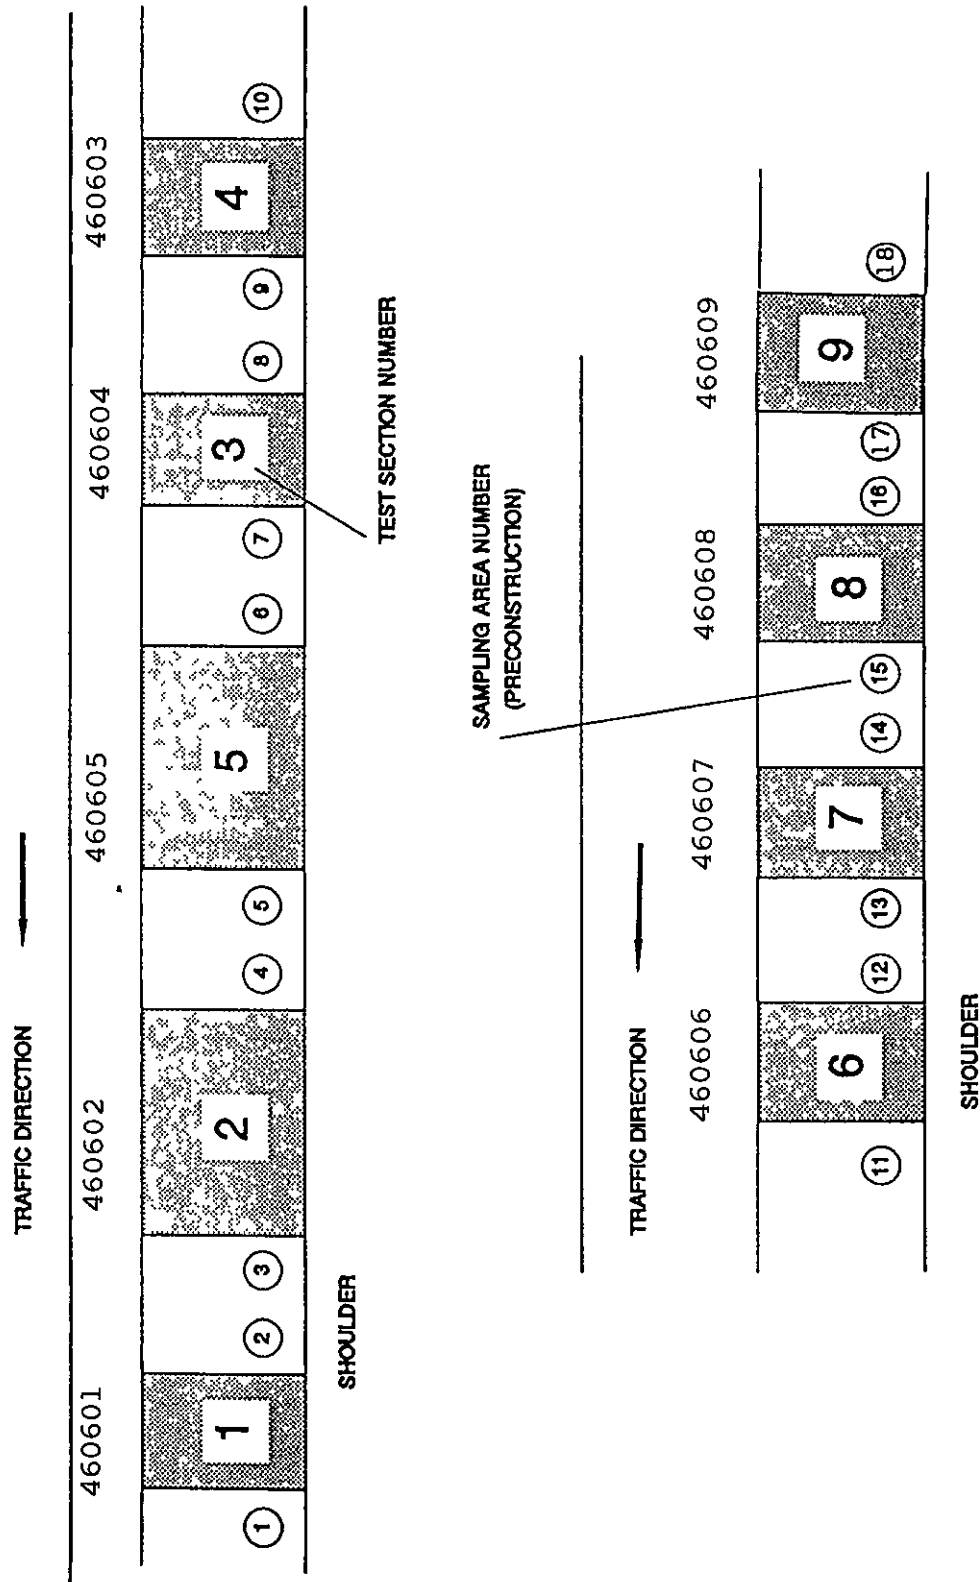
Example of "Pre-Construction" Sampling Area Plan
